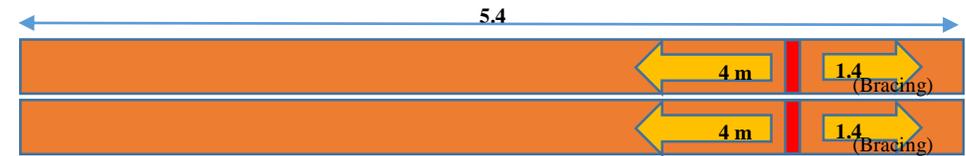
Cut 3 timbers to 4m lengths for front and rear cross structural support.
